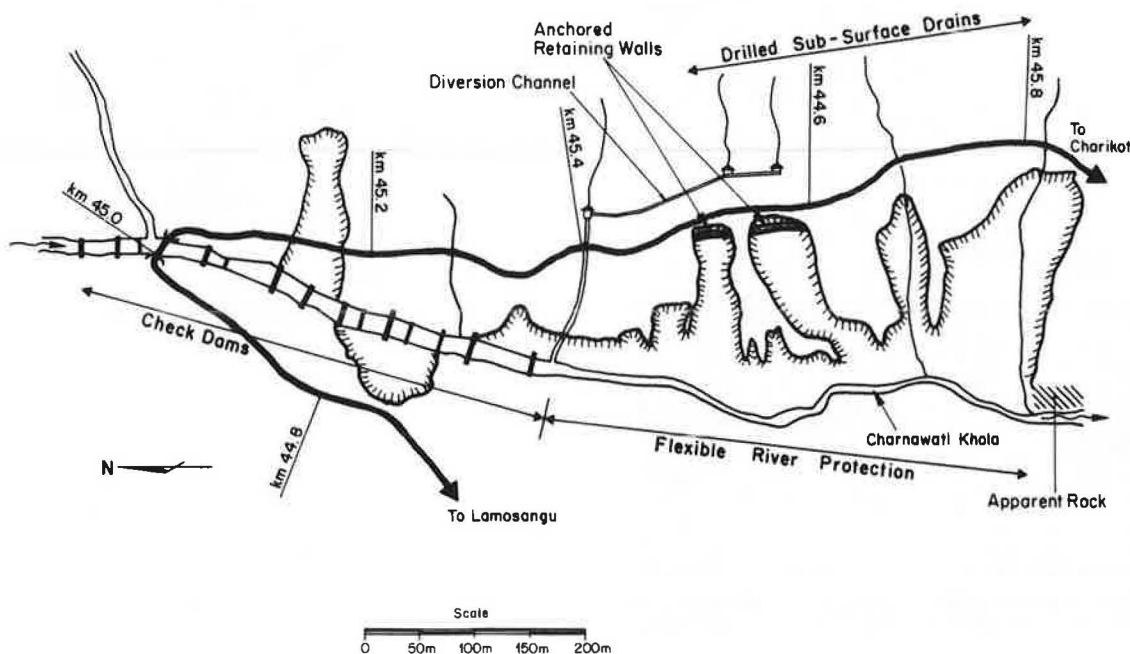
Charnawati Project: overall plan view. Only the main substantial structures are presented; drainage and biotechnical measures in the slides are not shown.
